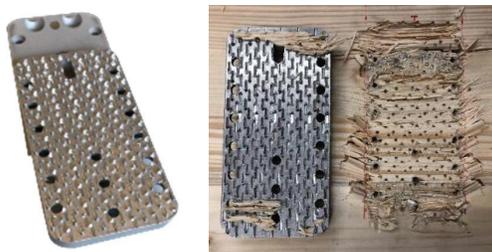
The modified surface of a joist hanger and failure mechanism after reaching the maximum load
